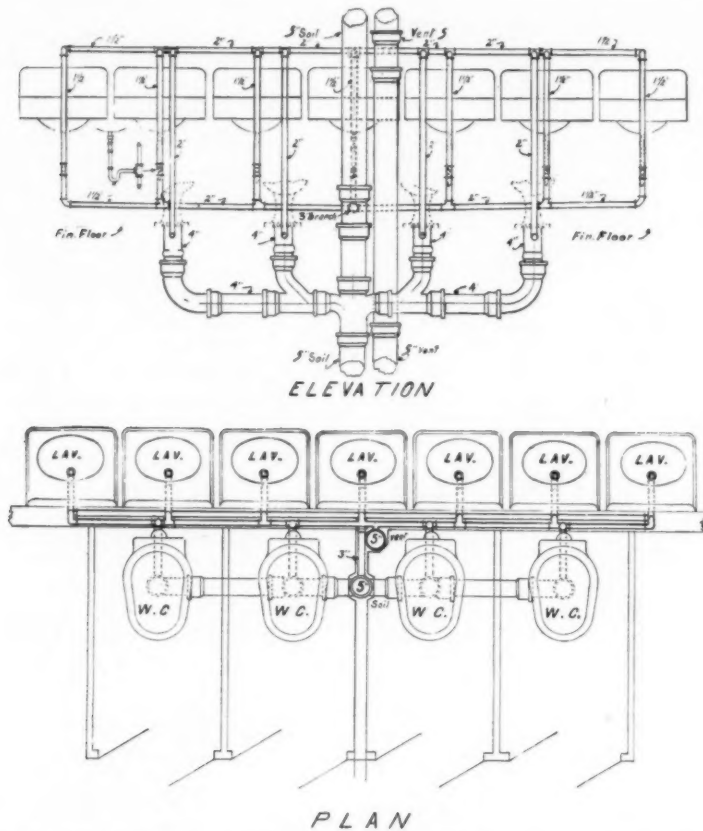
Detail of Similar Arrangement with Vented Traps, Under Plumbing Regulations, New York City.
